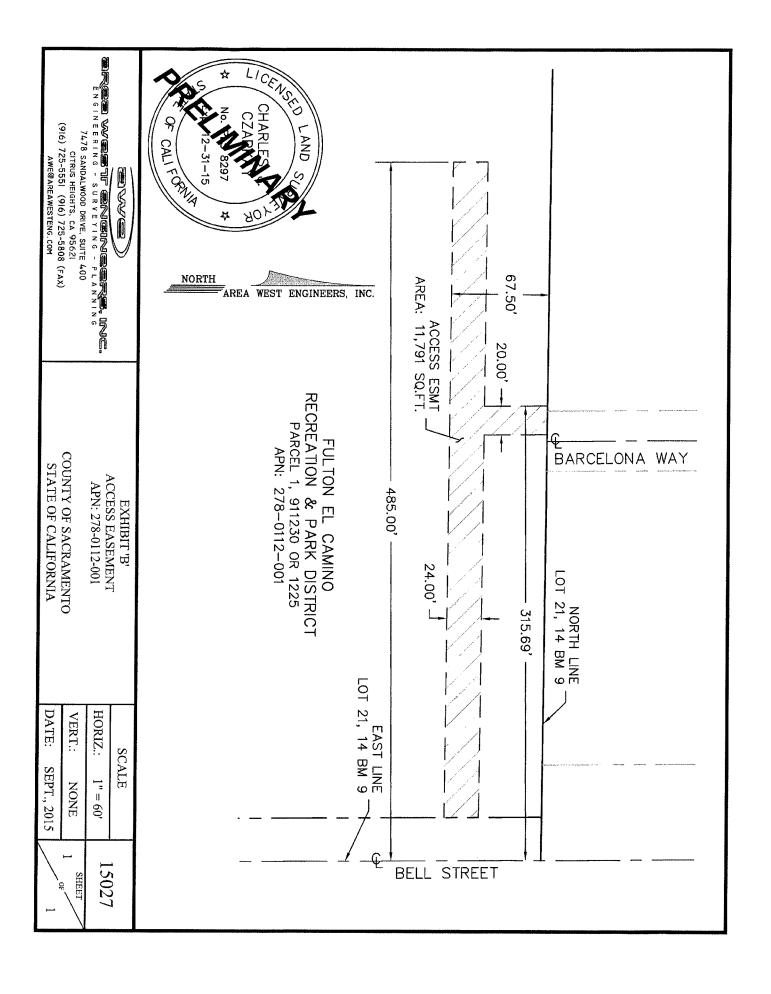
Foot Wide Access Easement APN: 278-0112-001
